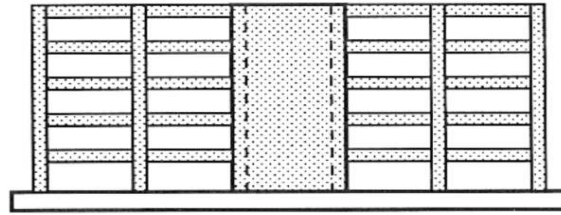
Front view of a dual wall-frame structure [Priestley et al., 2007].
